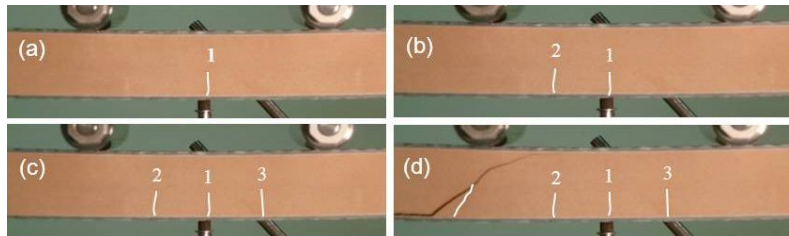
Typical static failure modes in Eco-Core sandwich beam specimen FSP-20 (Crack is highlighted by white line).
